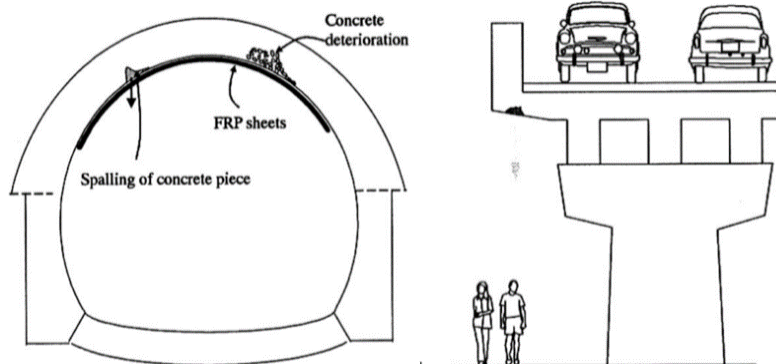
Schematic of concrete spalling from tunnel lining and slab of viaducts (Wu et al., 2005a)
